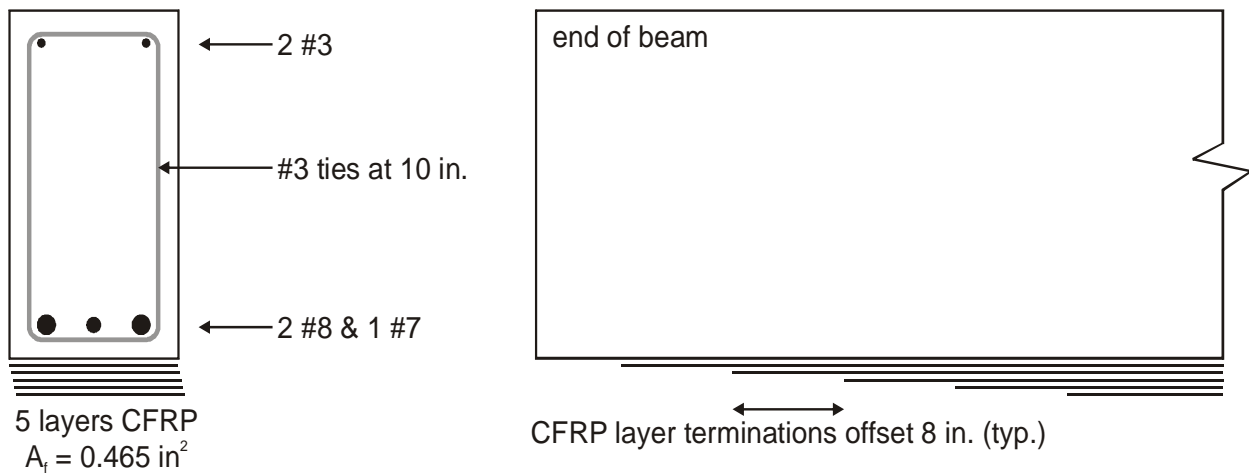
Specimen cross sections tested by Wight et al. (2001).
